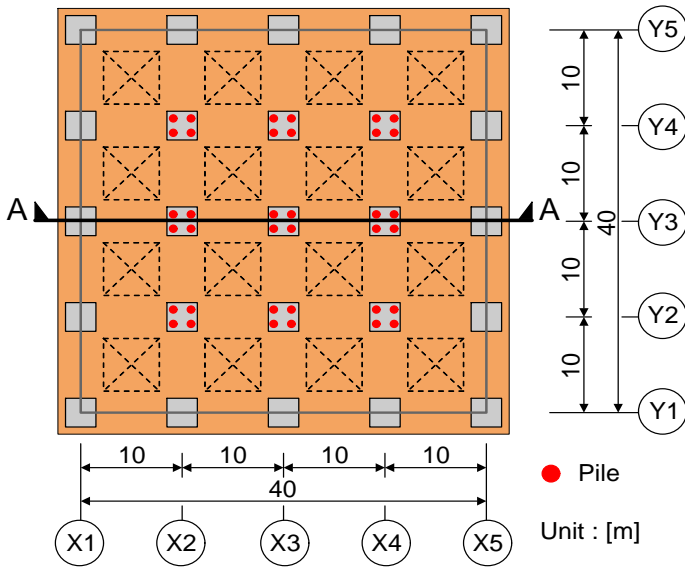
Plan view of Piled TNF ($n = 9 \times 4$)
